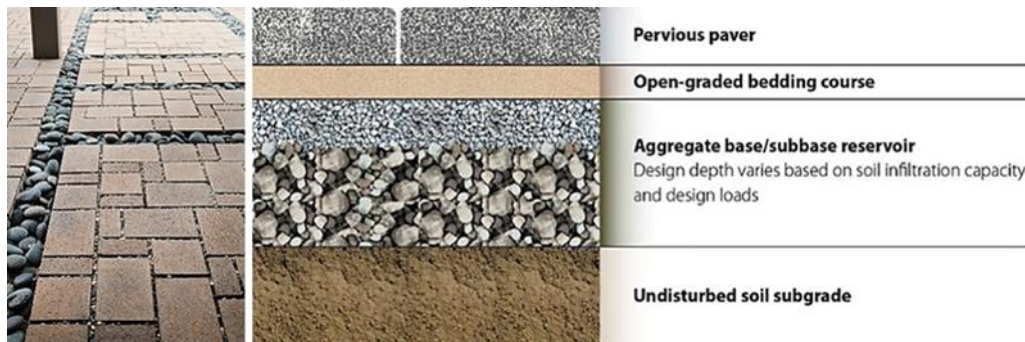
Right (A cross section showing the paving layers using the net paving method), left, (implementing the grid paving). Source: Right, ACRP Research report 178, Guidance for usage of permeable pavement, Left, Permeable or open grid concrete paving, 2019.
